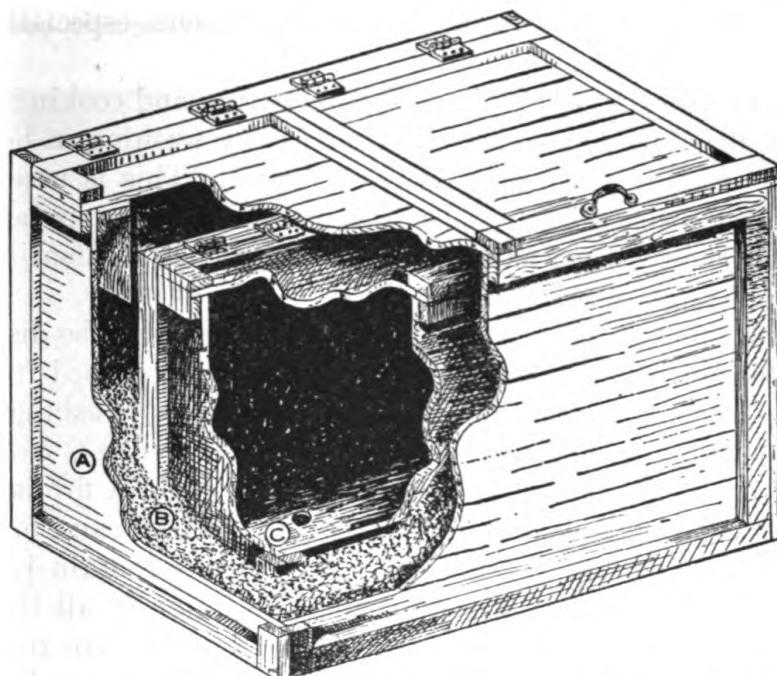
Underground ice or cooling box. A—Outer wall. B—Insulating material. C—Inner wall.
